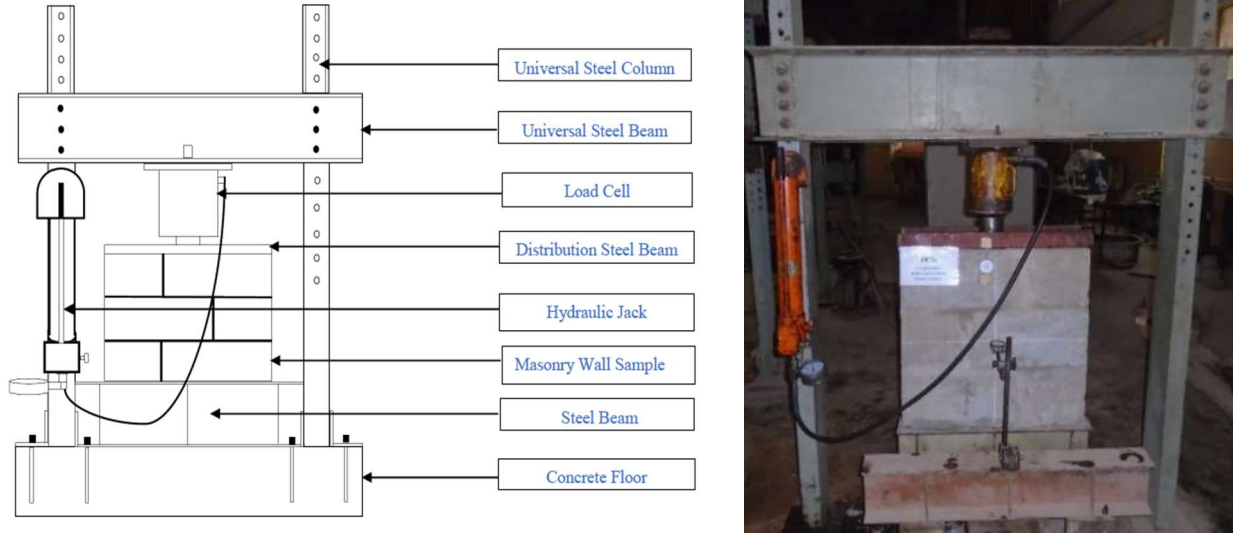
Details of Testing Rig for Compressive Strength Test of Masonry Wallete's
